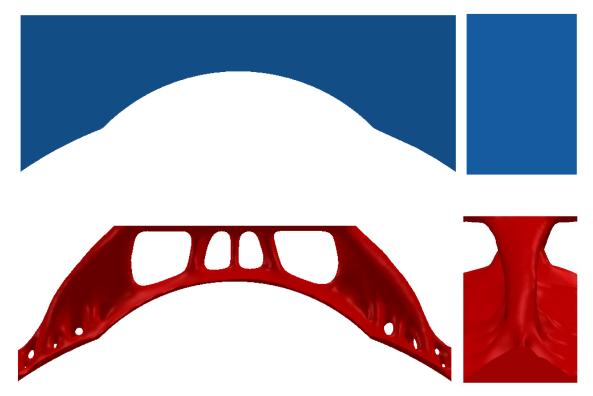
Front and Side Views of Base and. Final Optimized Design
